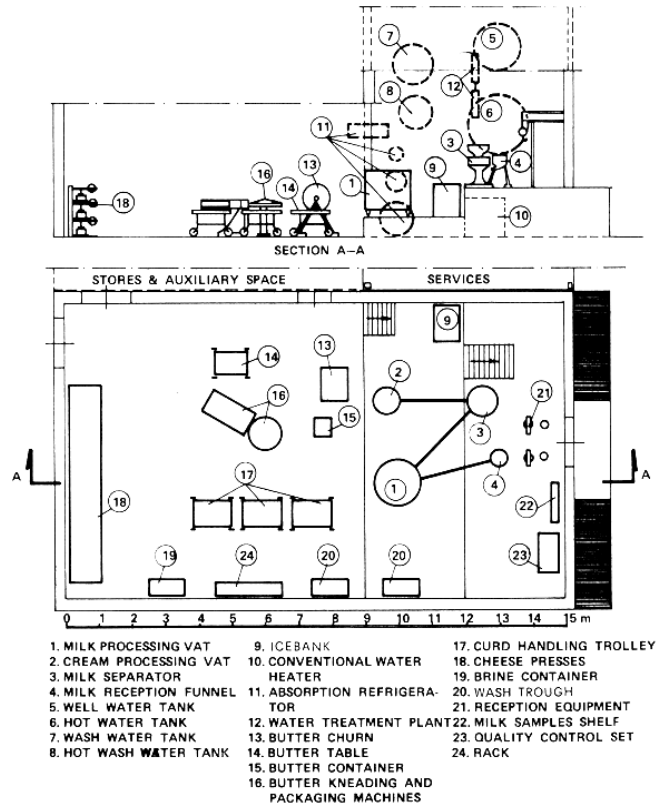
CHEESE AND BUTTER MANUFACTURE 630 l/day TO 1600 l/day FRESH MILK INTAKE. - EQUIPMENT SHOWN FOR 1600 l/day.
